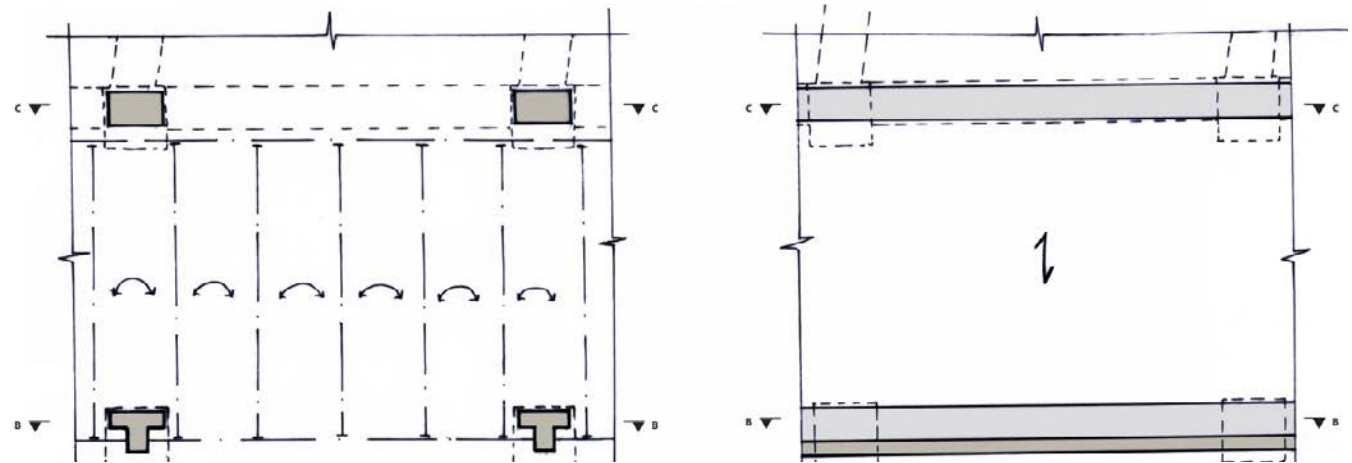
Existing jack arch deck with proposed support locations for new concrete deck
